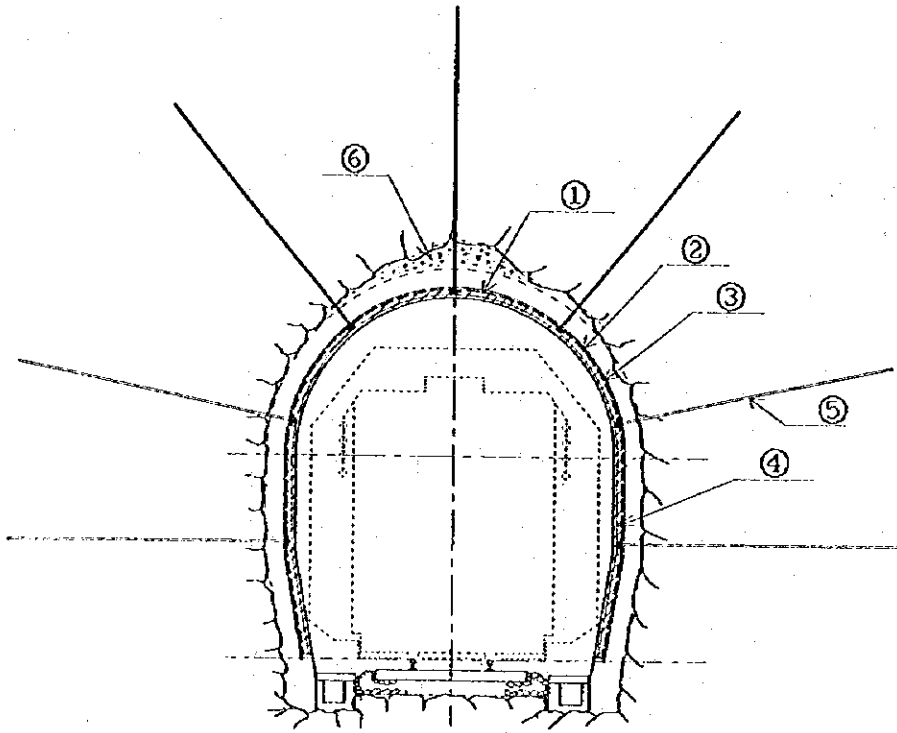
Type 1 Tunnel Improvement Work
